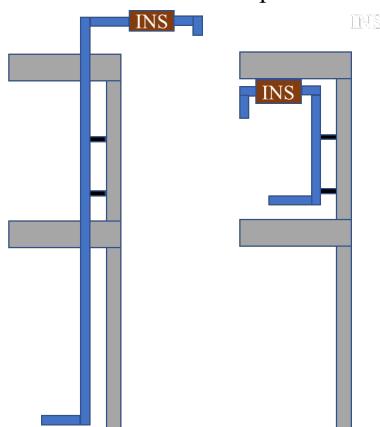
Schematic setup of the pipe systems in the building-like test stand, left: long pipe over several storeys, right: short pipe section within one storey.
